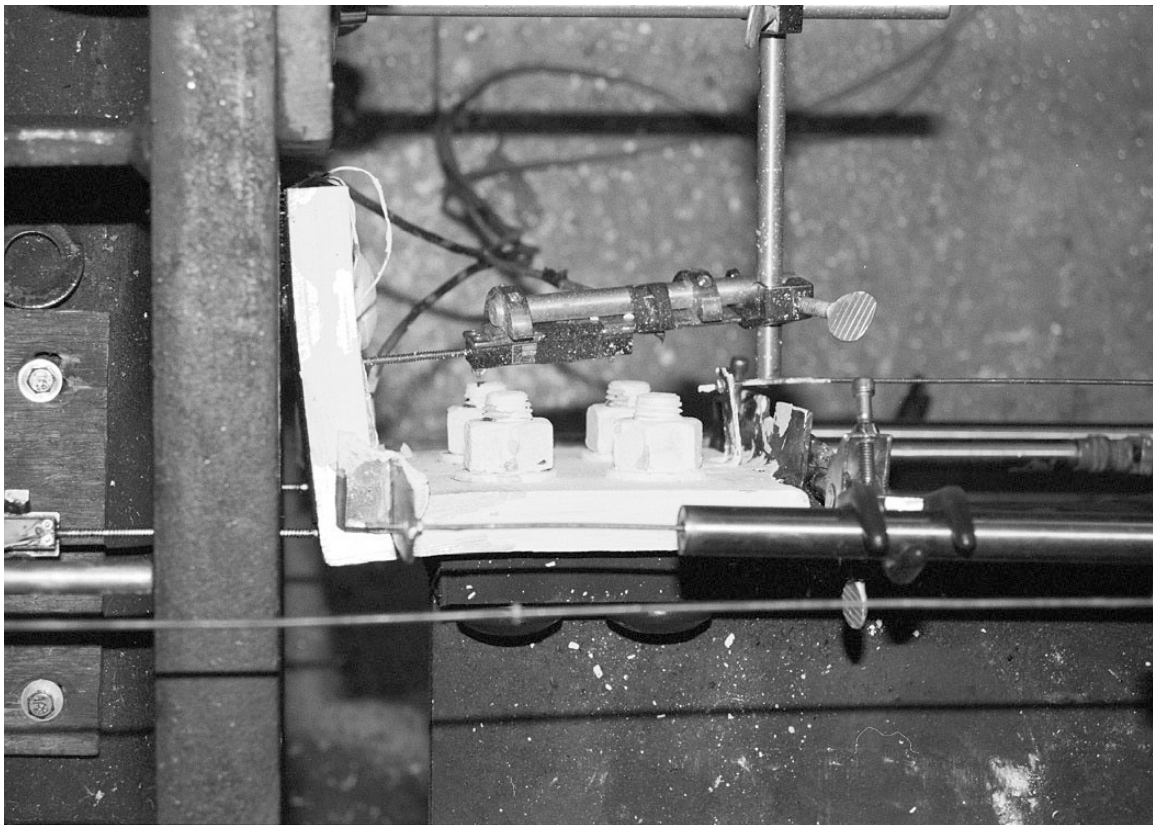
Angle Component During Testing Prior to Tension Bolt Fracture
